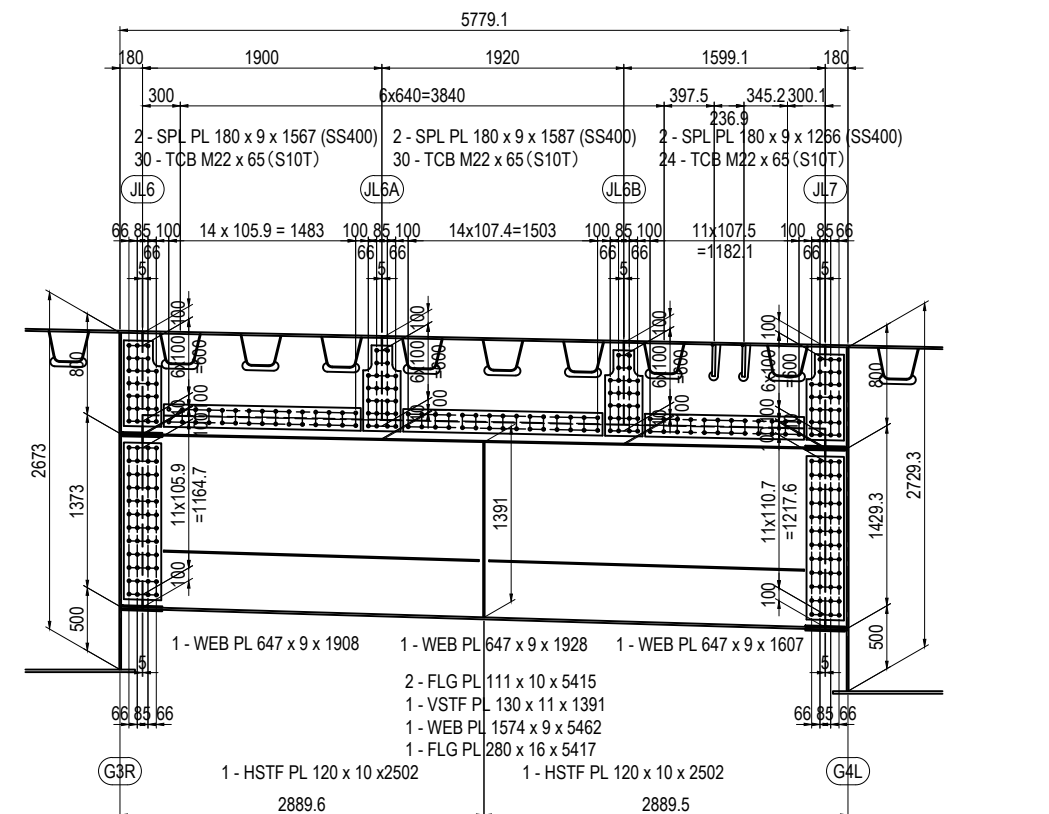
DETAIL OF CROSS GIRDER SECTION (6) S=1:60 C4 TO C12 (3)
